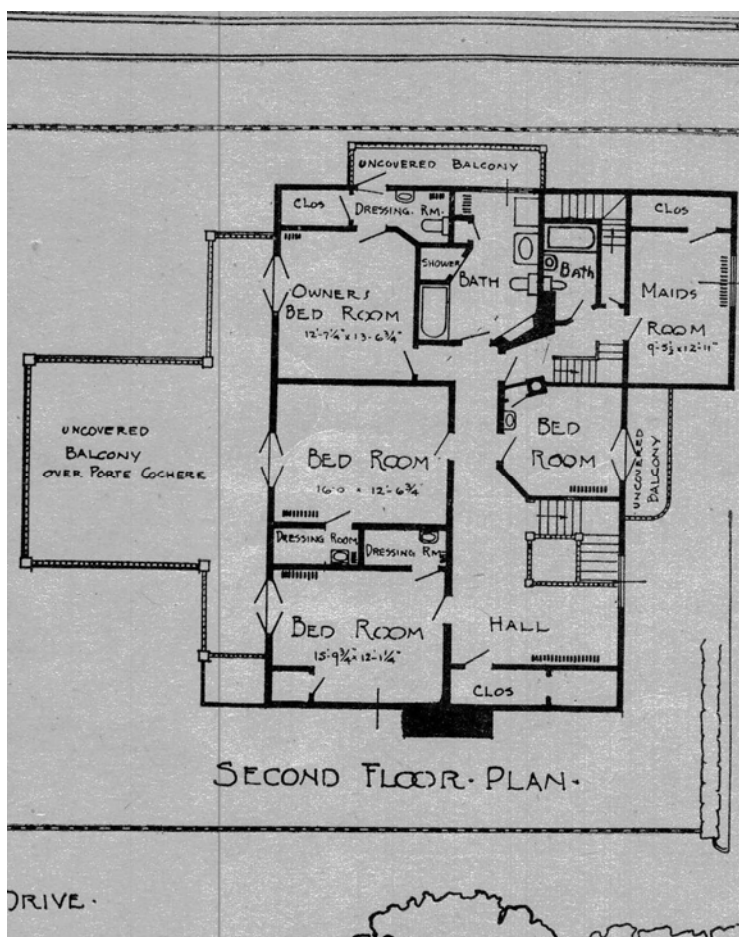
Second Floor Plan, Excerpt from 1924 Plat of Property
